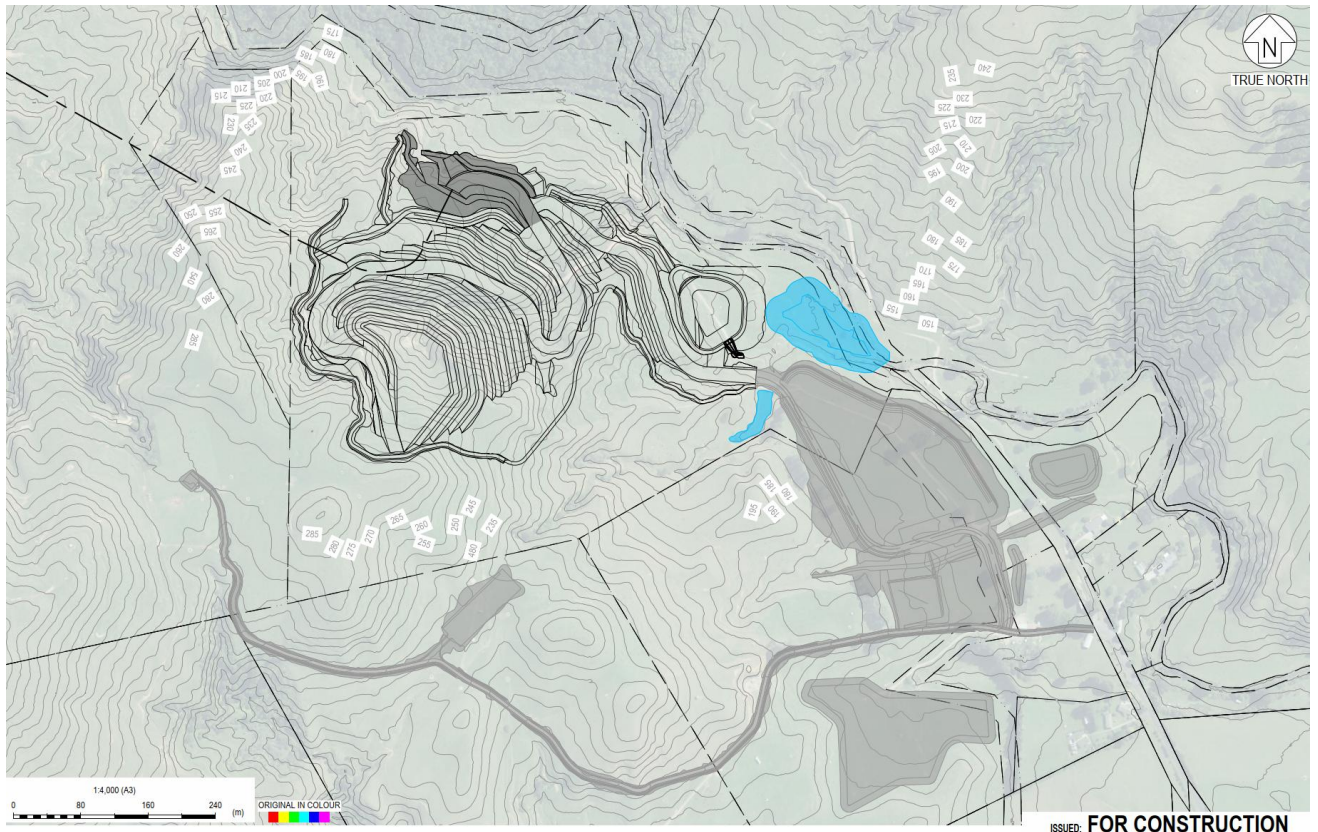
Willows Road Surface Facilities Area General Arrangements (Source: EGL).
